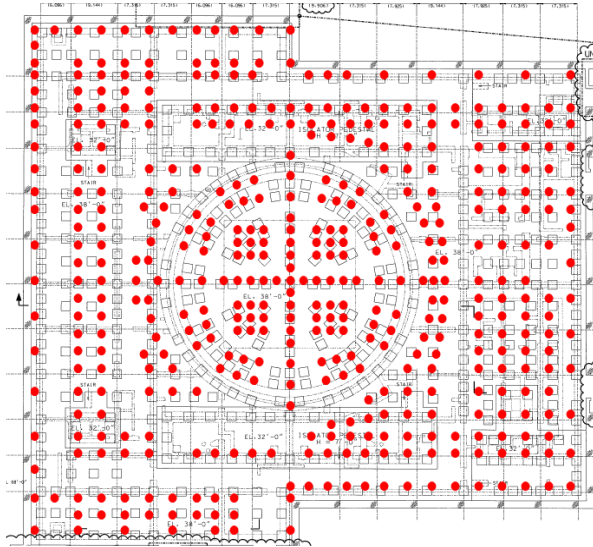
Plan View of Isolator Layout for APR1400 (Lee, 2013).
